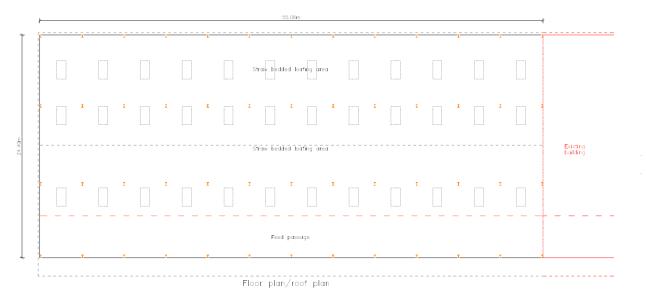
Building A - Proposed Floor Plan / Roof Plan
